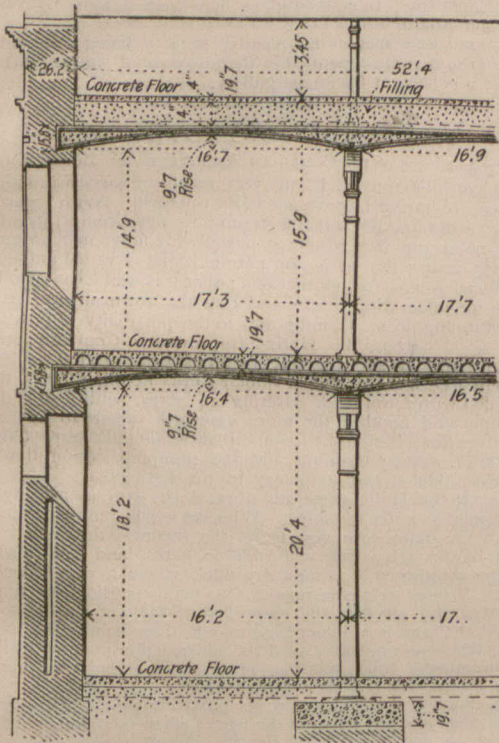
TRANVERSE SECTION OF BREWERY AT BUDAPEST, SHOWING WUENSCH SYSTEM OF IRON AND CONCRETE FLOOR CONSTRUCTION.
